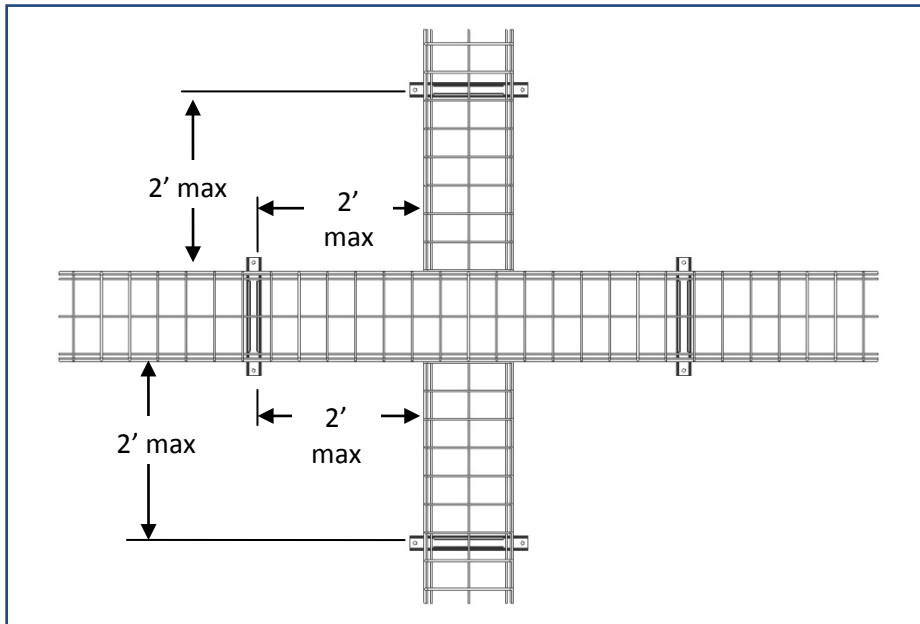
Support Recommendation for Horizontal Cross Intersections, Top View
